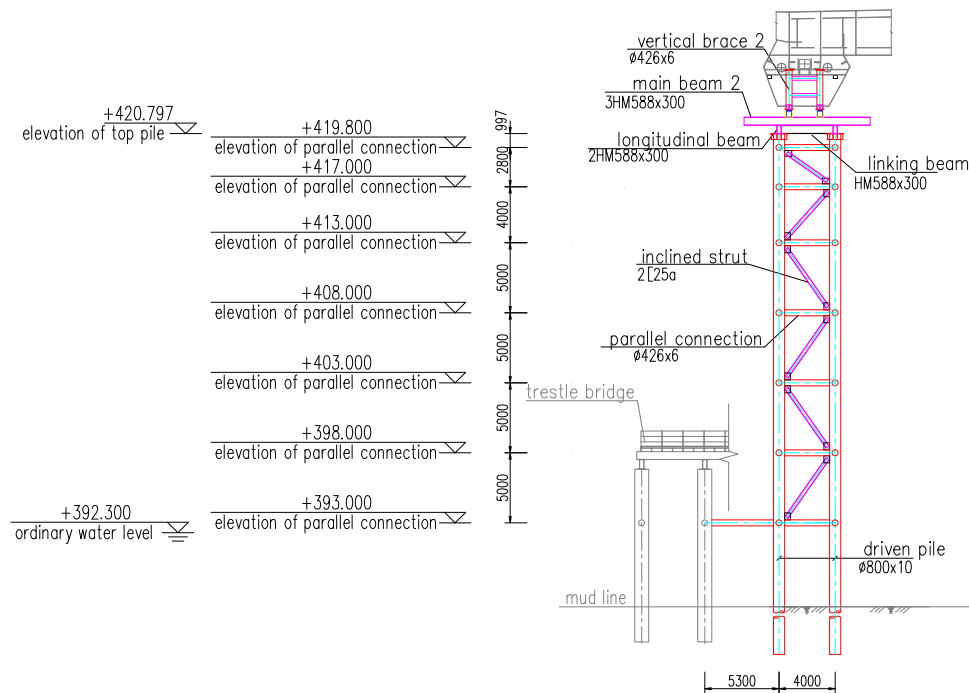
The sectional drawing of the assembling support of the V-shaped lower tower columns on the downstream side
